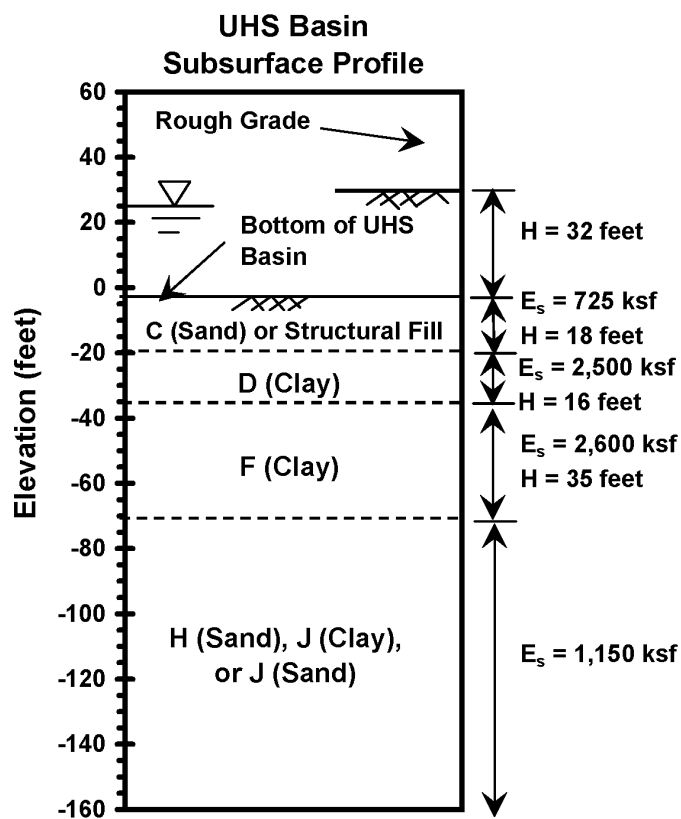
S.4-70 Adopted Subsurface Profile for the UHS Basin/ RSW Pump Houses STP 3 & 4 Radwaste Buildings
